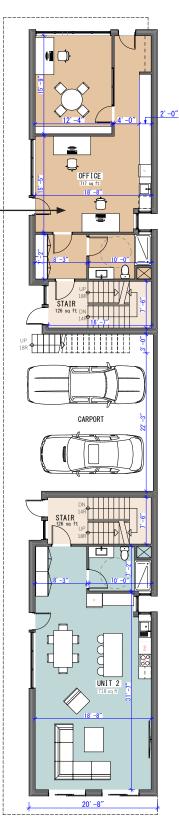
Prototype-2 first floor plan, alternate barrier free unit.
